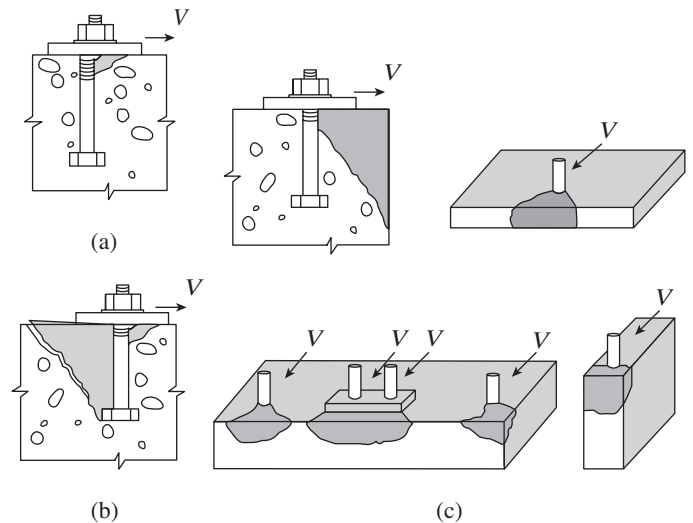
Failure modes for anchors under shear loading (a) Steel failure (b) Concrete pryout failure (c) Concrete breakout failure
